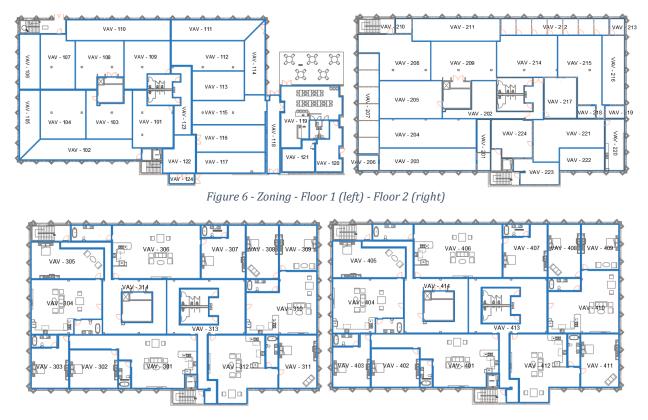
Zoning - Floor 3 (left) - Floor 4 (right)
